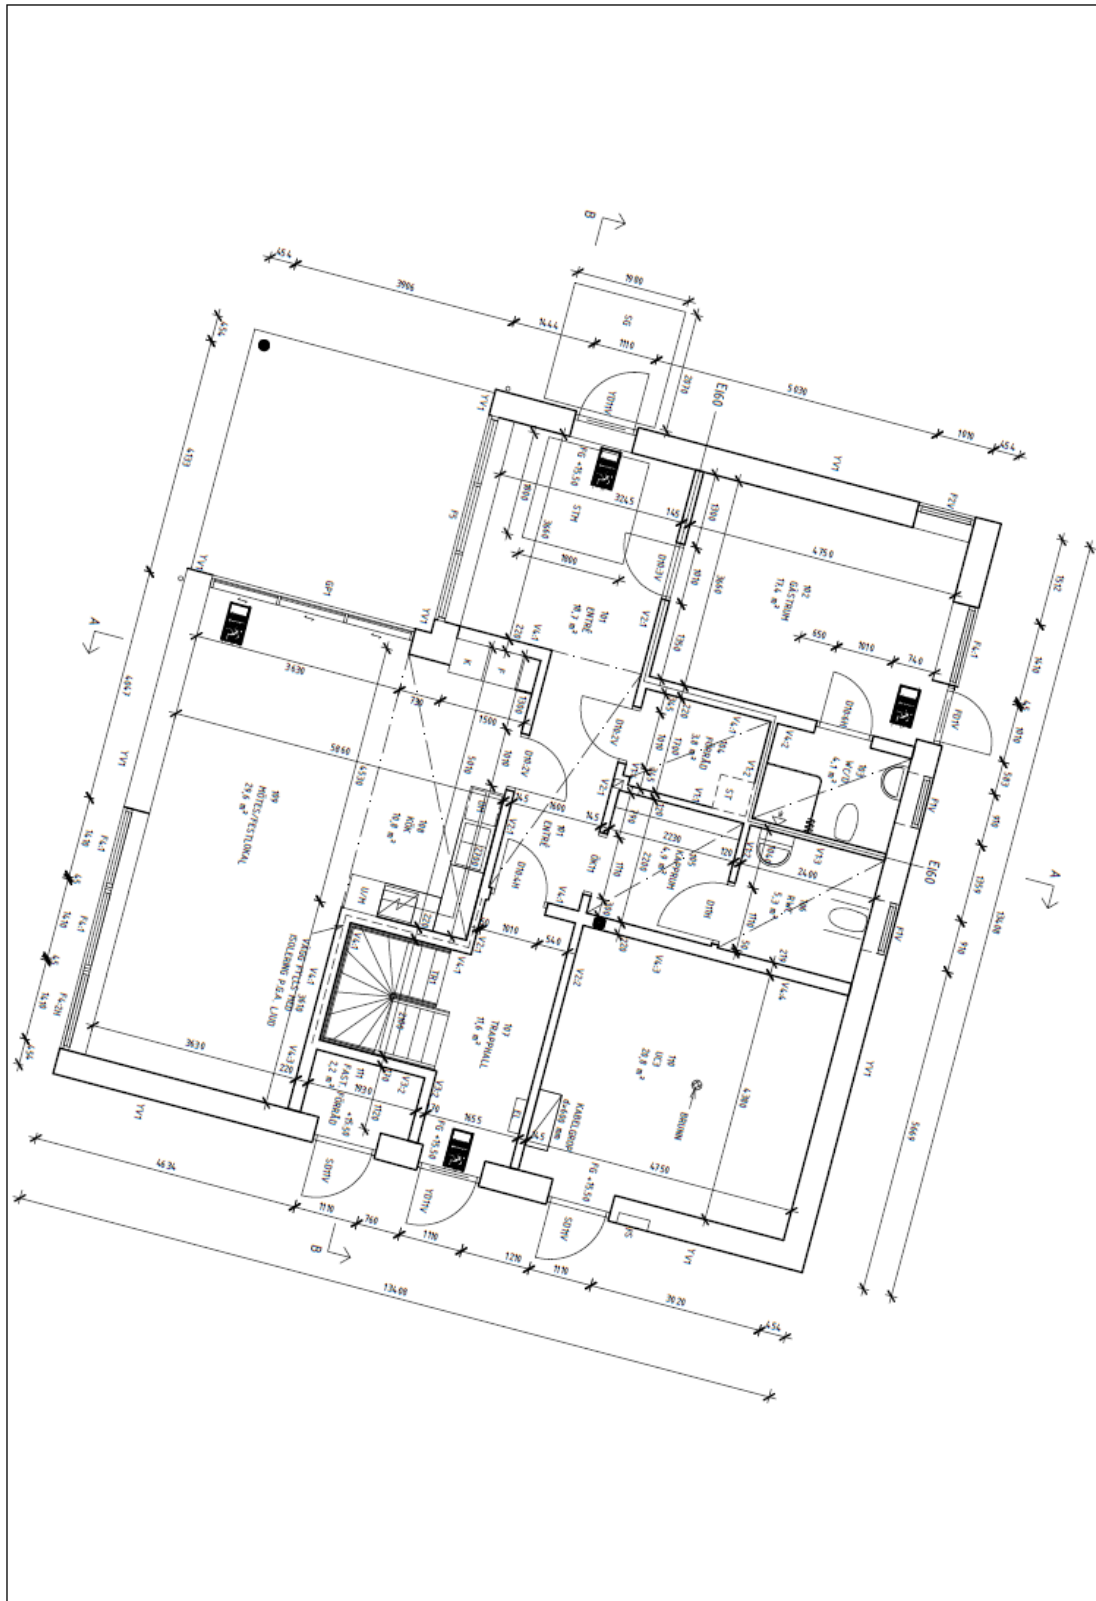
Plan drawing, 1st floor in Community building (Architect: Håkan Markgren)..
